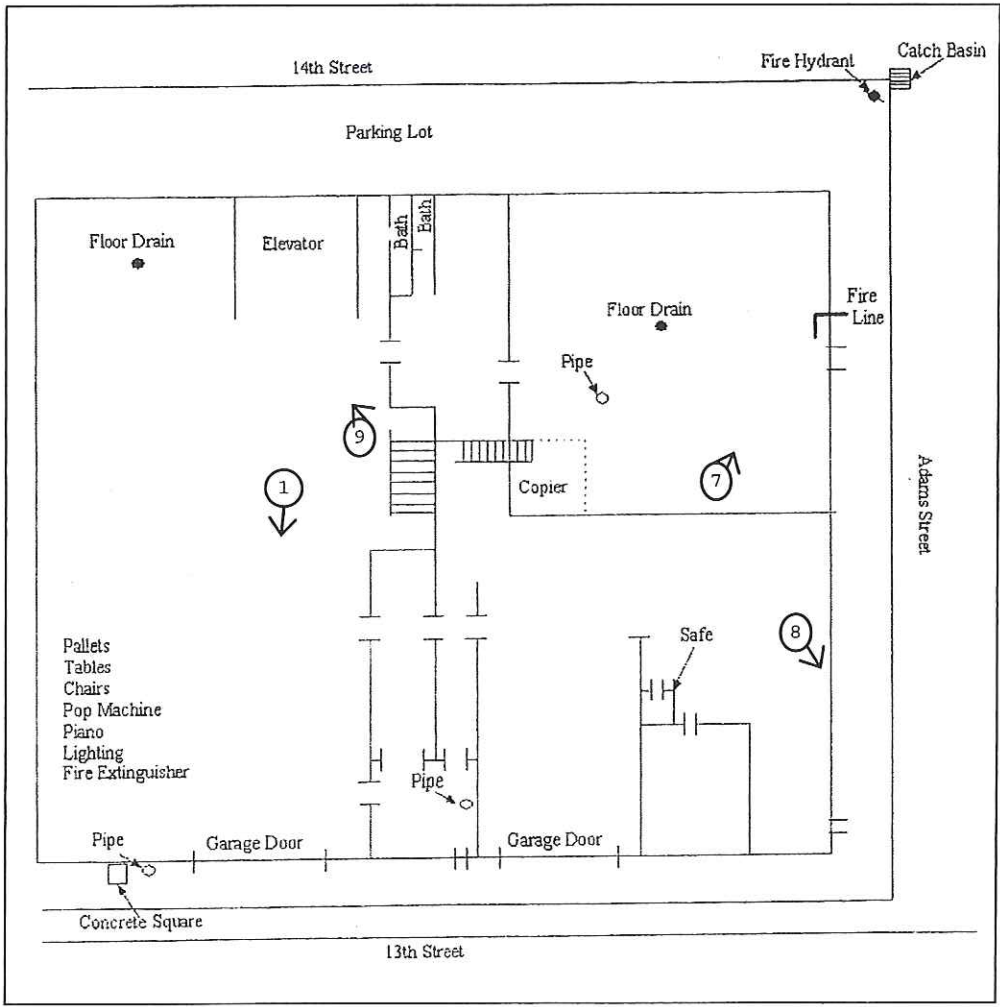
First Floor Plan, 1301 Adams Street showing locations of photographs 7-10
